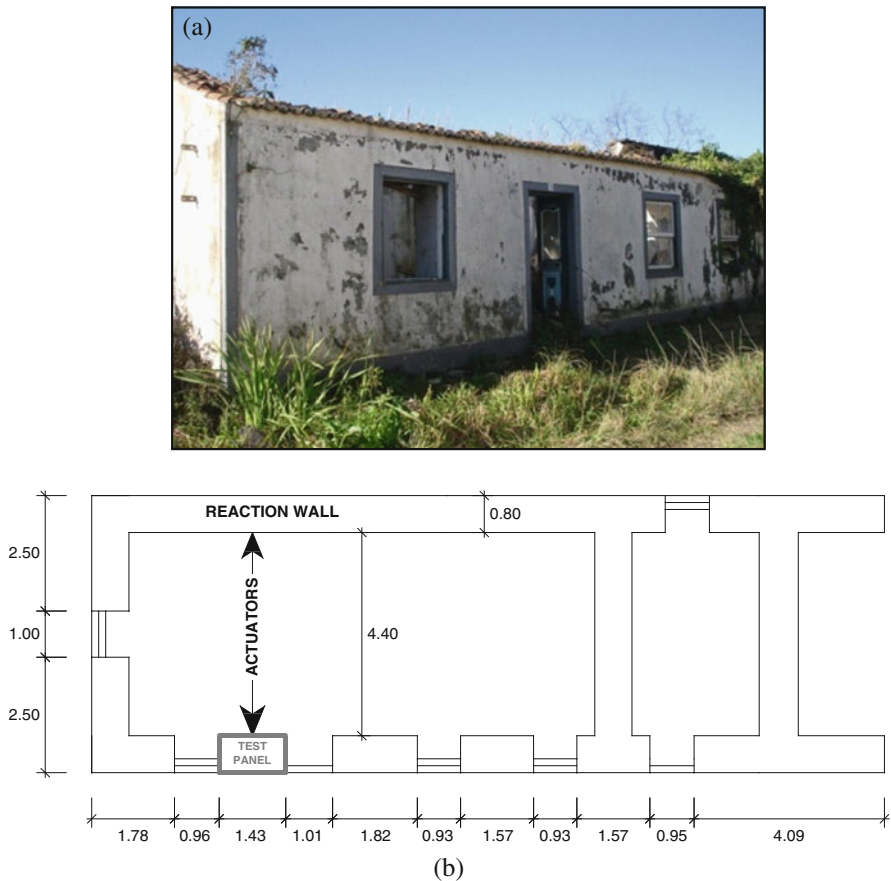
Building 1: a main façade; b structural configuration of the bearing walls including the location of the tested element
